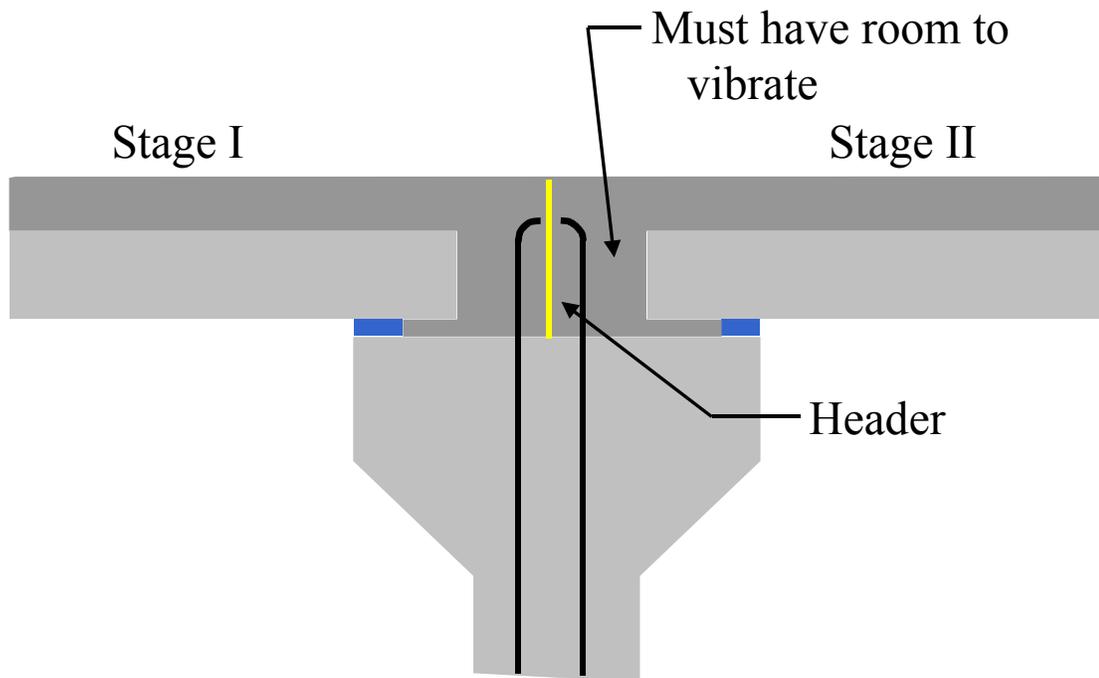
Revised Construction Joint to Allow PCP Use for Phased Construction
